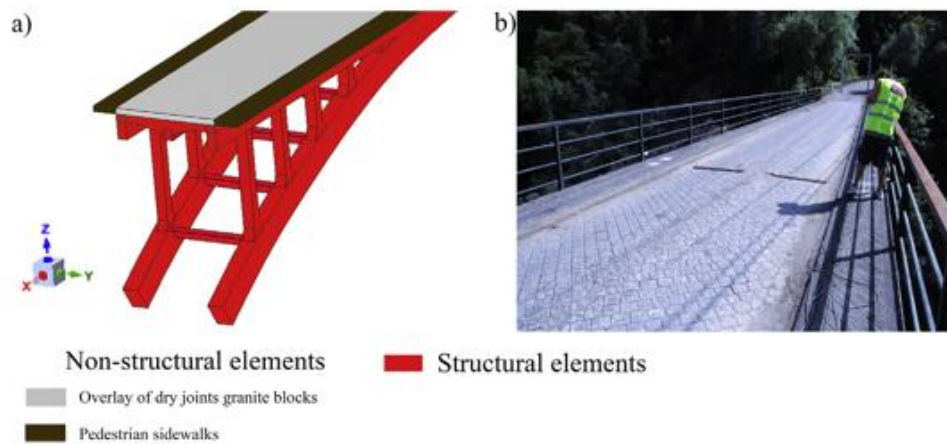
Non-structural elements of the Bôco Bridge: a) Deck overlay composed by dry joints granite blocks and pedestrian sidewalks; and b) General view of the non-structural elements, overlay, pedestrian sidewalks and metallic parapets.
